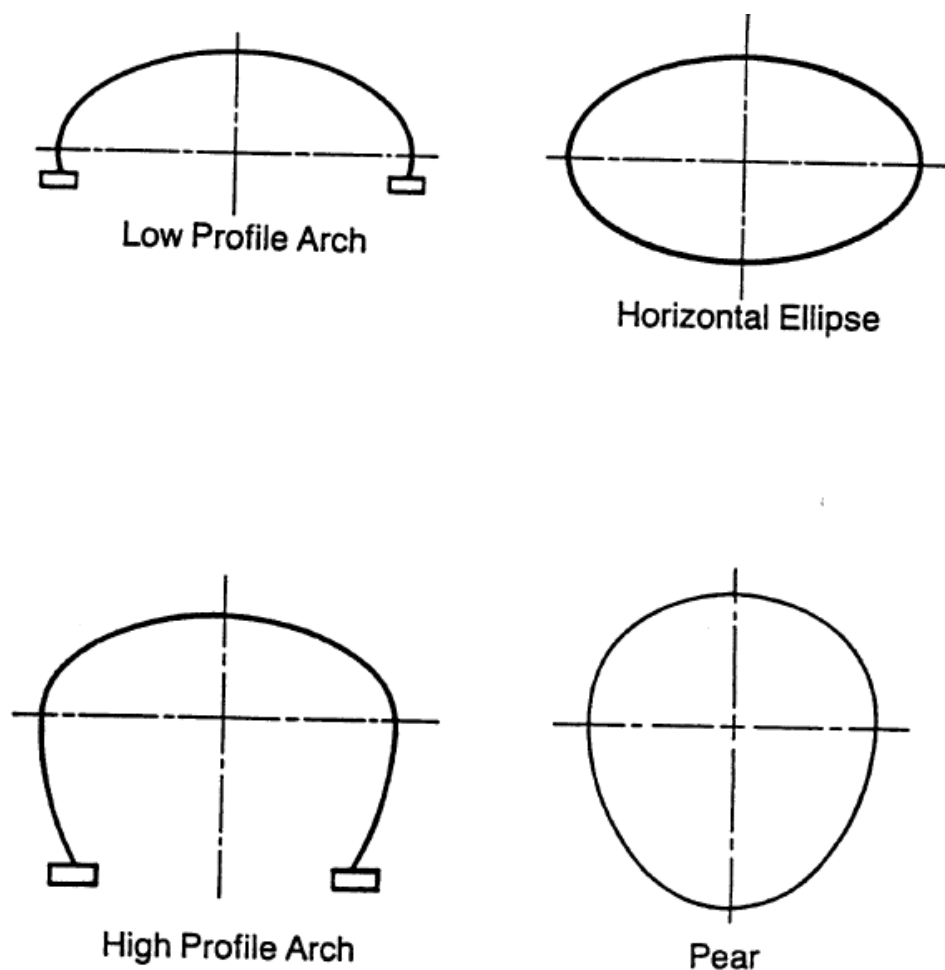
(Exhibit 93) Typical Long-Span Shapes
